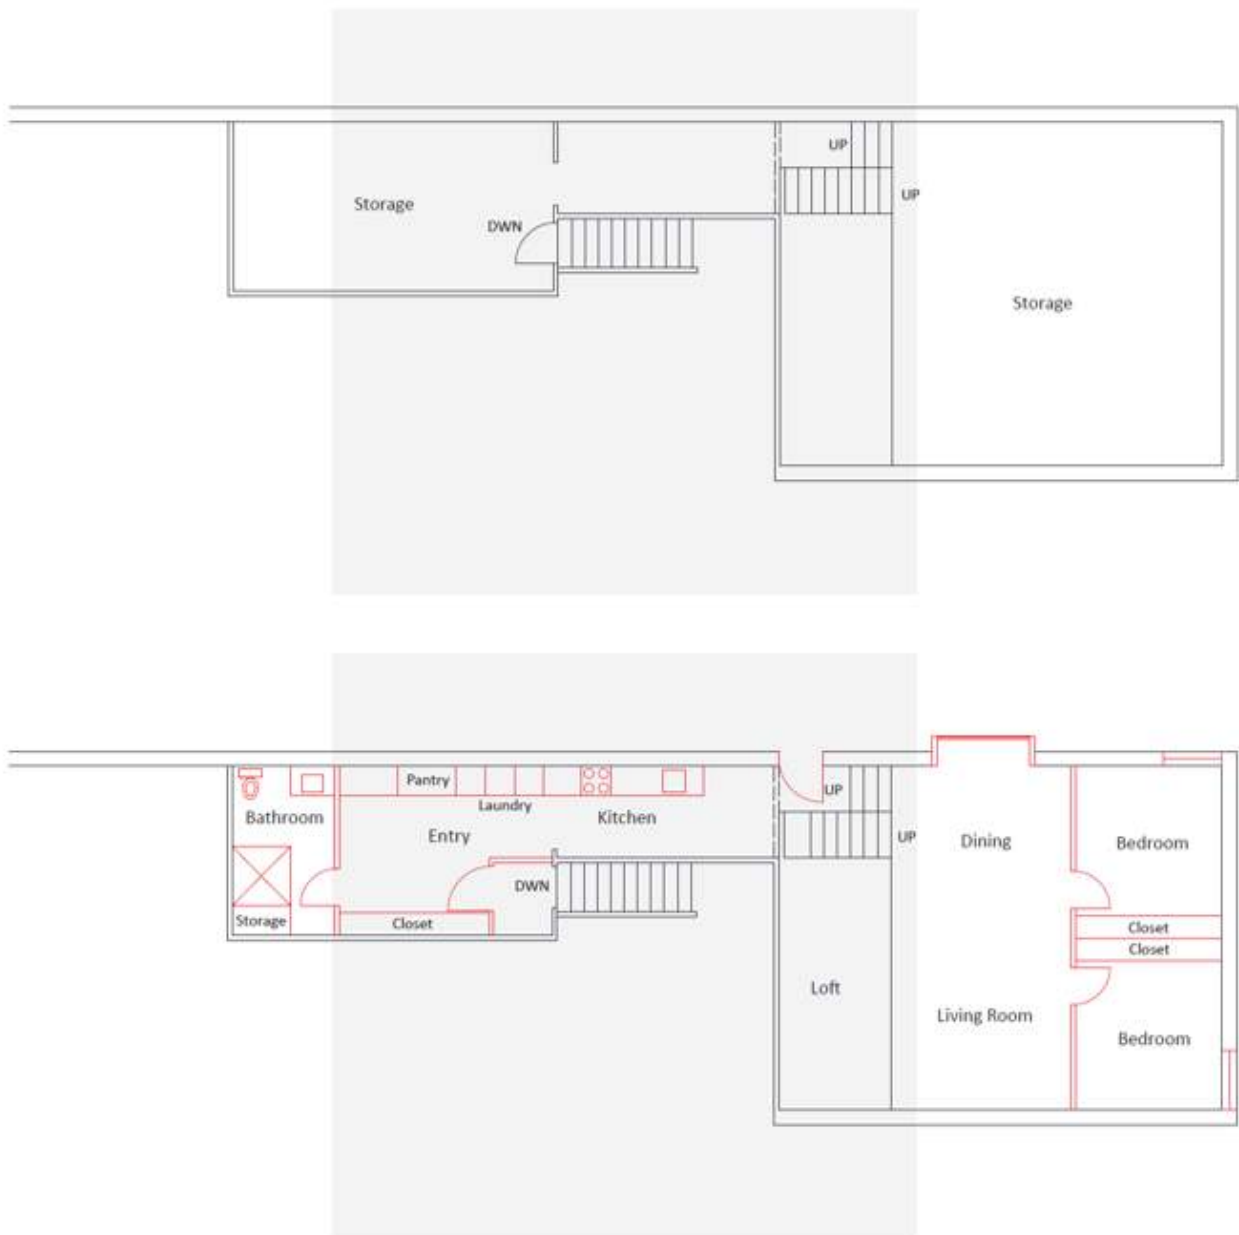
Existing and Renovation Plans of Upper Floor 18W 1st St, Duluth MN.
